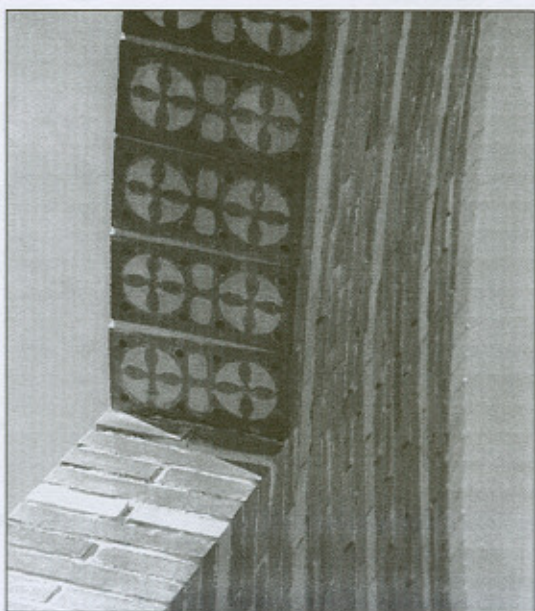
Detail of the concave external brickwork, with bed and vertical joints of standard thickness and pointed in mortar.
